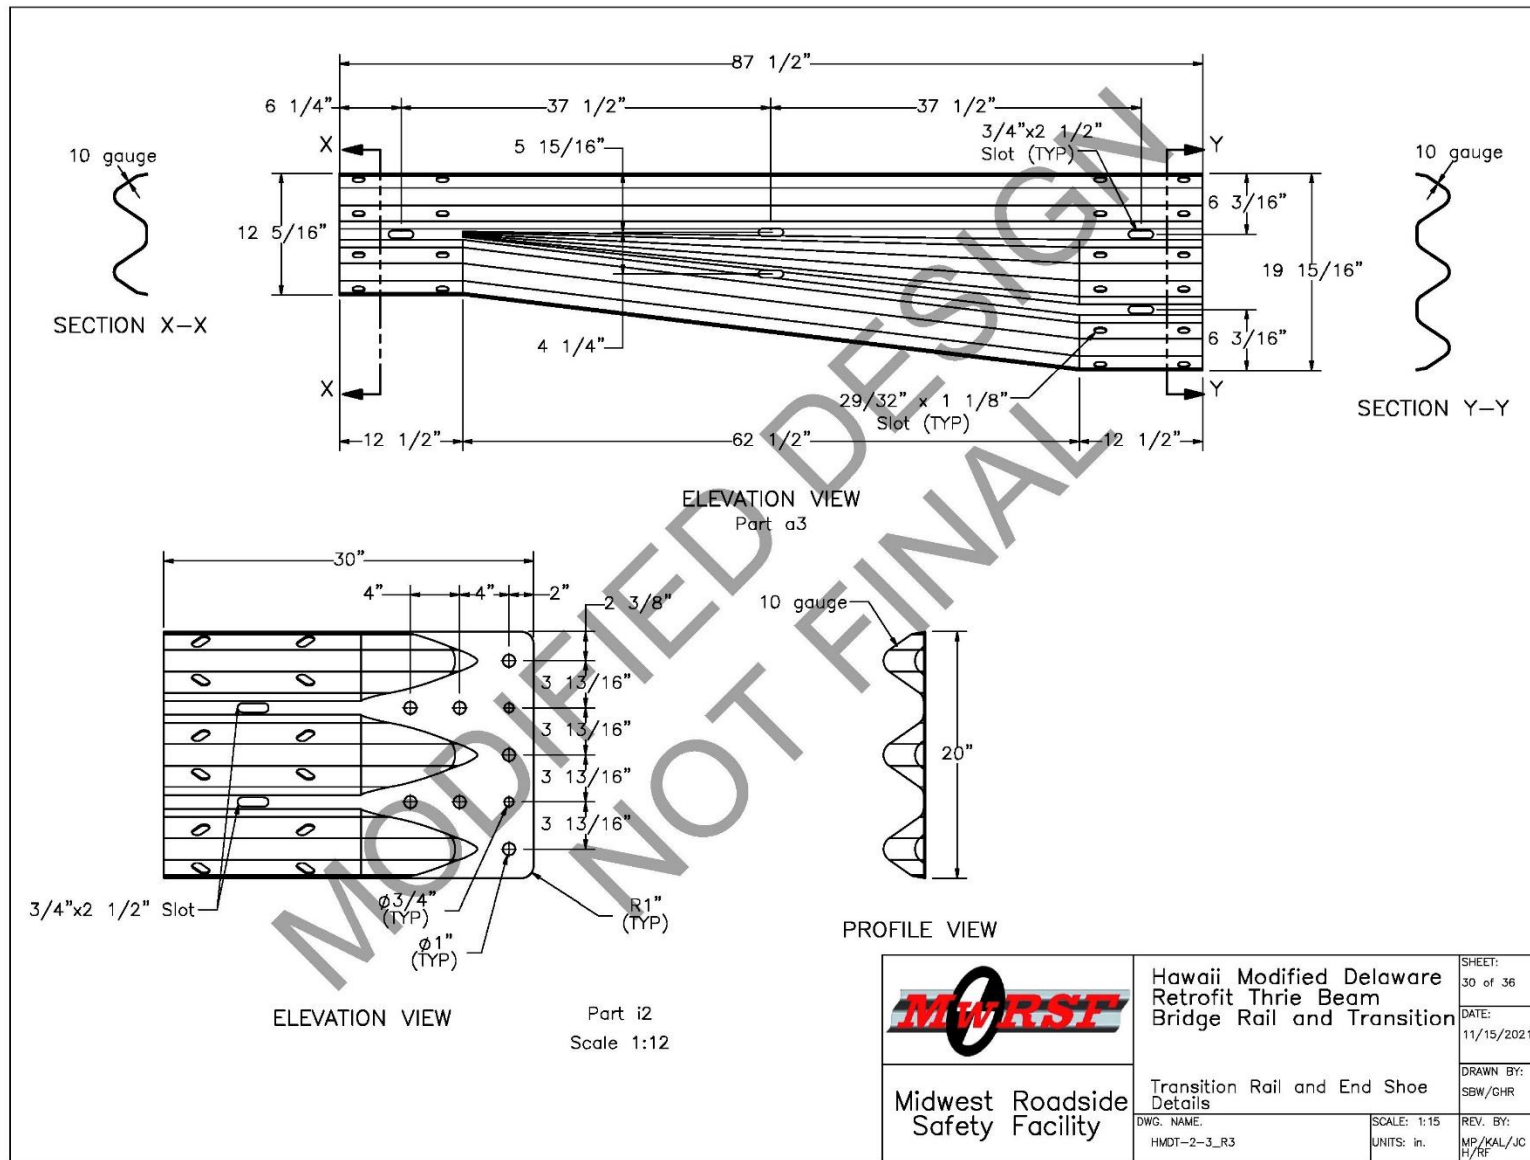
Transition Rail and End Shoe Details, Test Nos. HMDT-2 and HMDT-3
